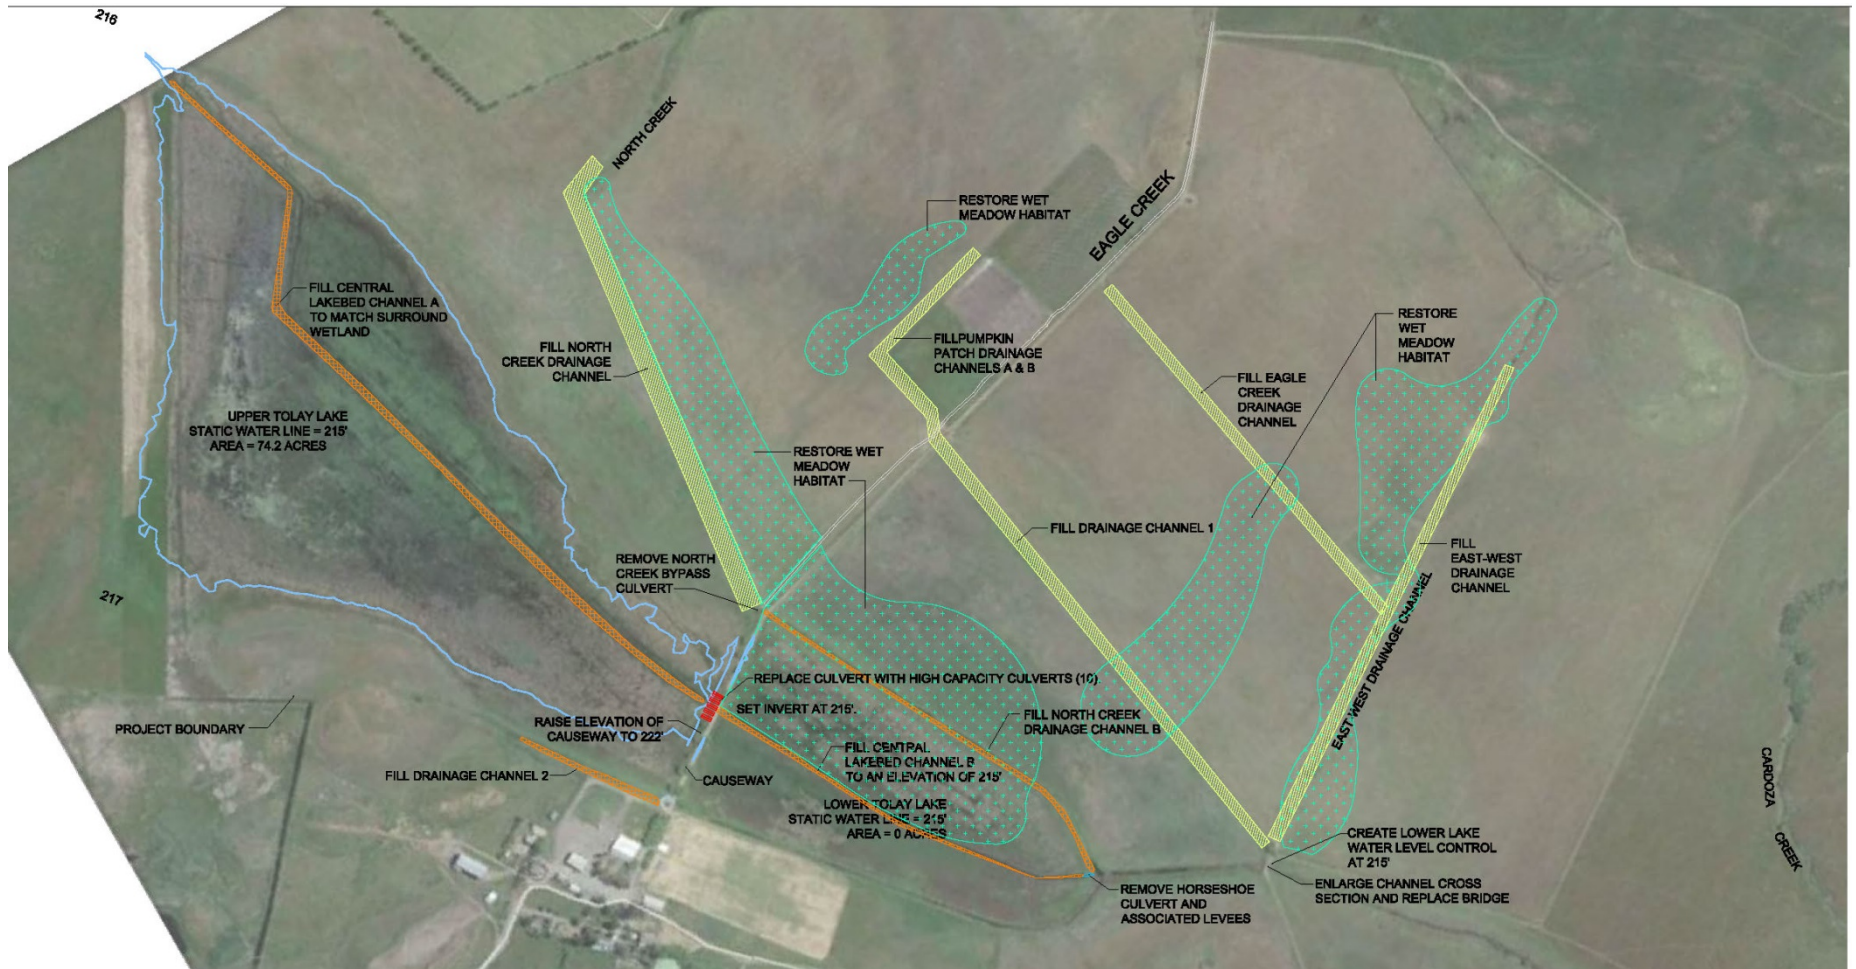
Conceptual design for lake restoration Alternative 1 – Lake Outlet Elevation at 215'.
